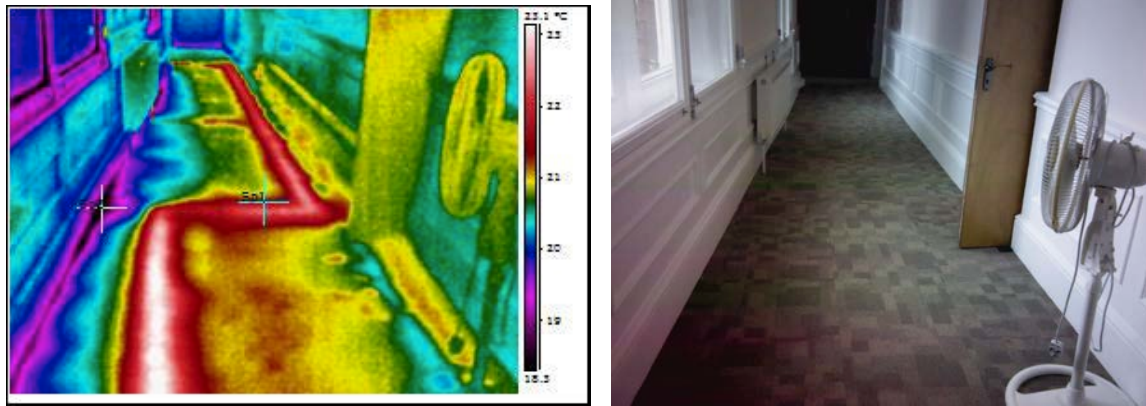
Room F09, First floor corridor. New heating pipe (underfloor) for radiator in F10. The image also shows the thermal bridges at the junction of external wall and first floor line.
